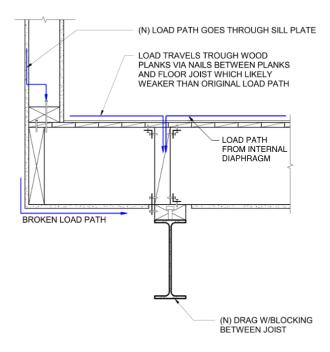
Force transfer through straight sheathing to a new collector (or drag).
